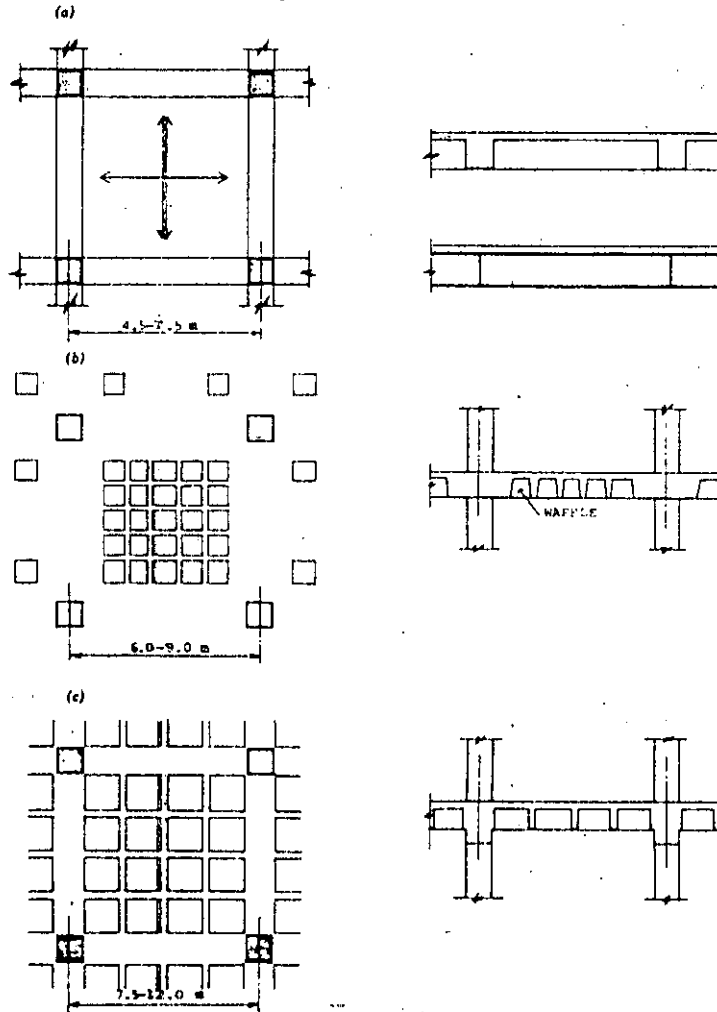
Two-way systems: (a) Flat slab spanned between girders or bearing walls; (b) Waffle slab supported by columns; (c) Two-way joists (ribbed slab)
